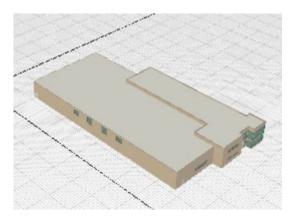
BIRD'S EYE VIEW OF COMPLETED BUILDING SHELL
